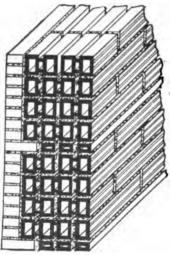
Tile One Cell High Can Be Used. It Is Cheaper to Lay a Wall with the Three Cell Tile, As the Higher Tile Need Less Labor in Setting for a Given Height of Wall, Besides Requiring Less Mortar
